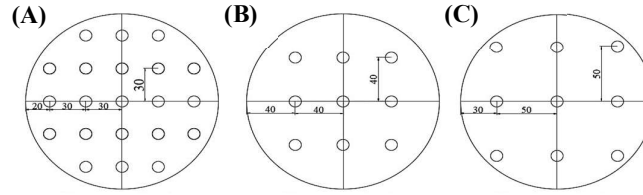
Various configurations of the 160-mm circular piled raft system: (A) 3d sapcing, (B) 4d sapcing, and (C) 5d sapcing.
